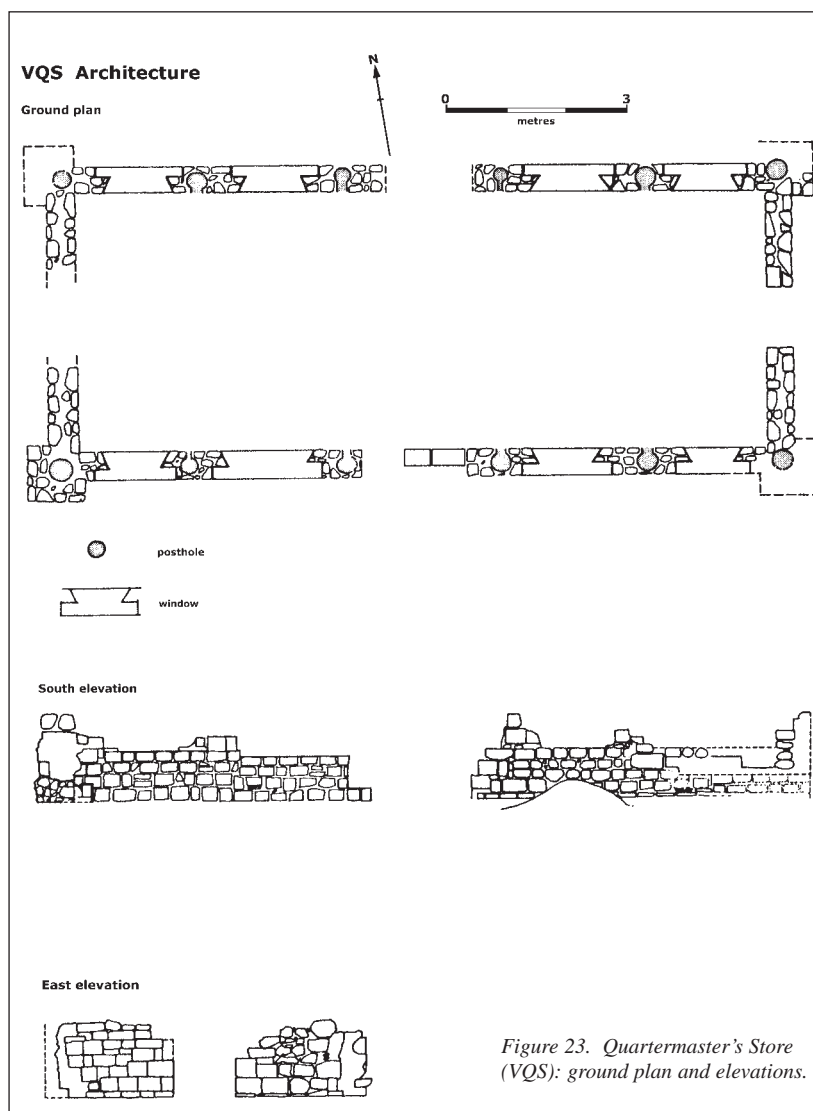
Quartermaster's Store (VQS): ground plan and elevations.
